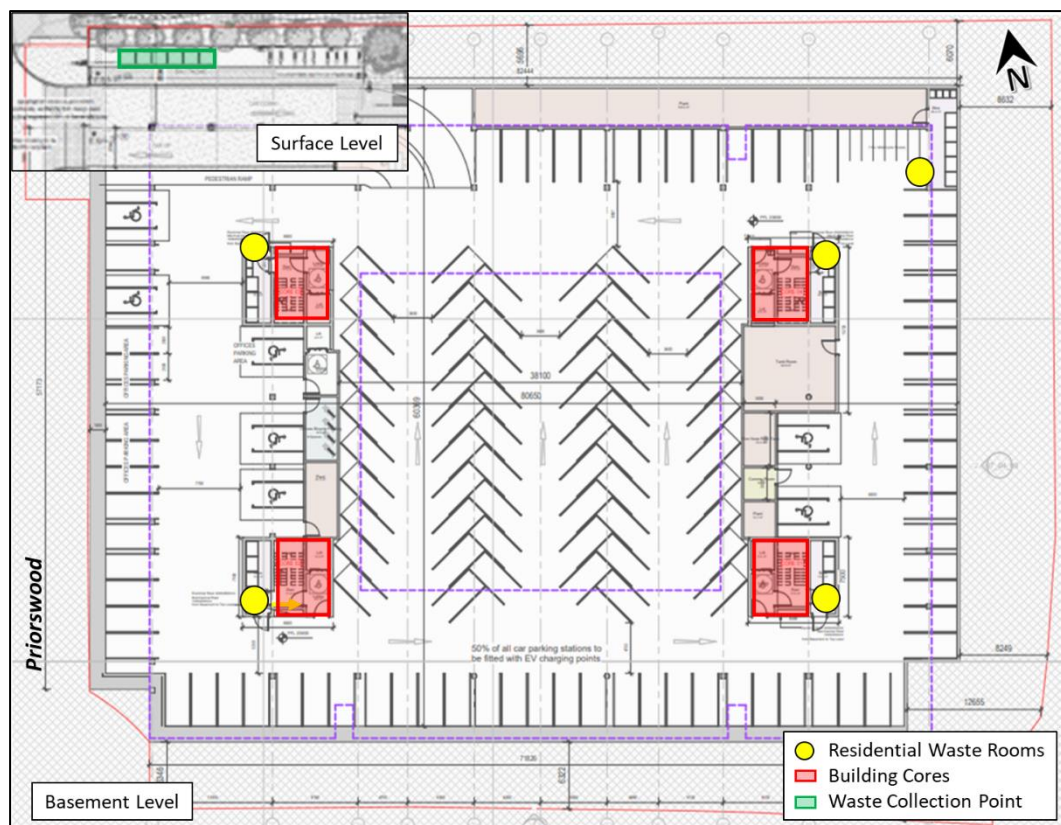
Waste Storage Areas & Collection Point within Site Layout
